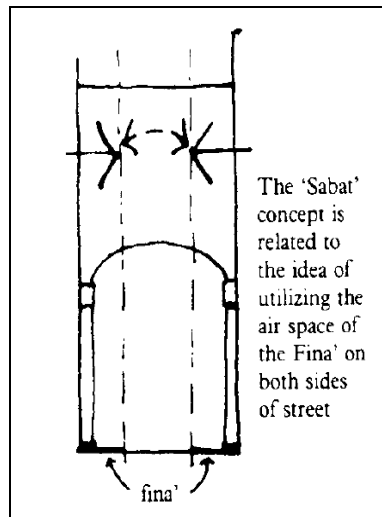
Concept of Sabat (room bridging street) (Hakim, 1986, p. 28)
